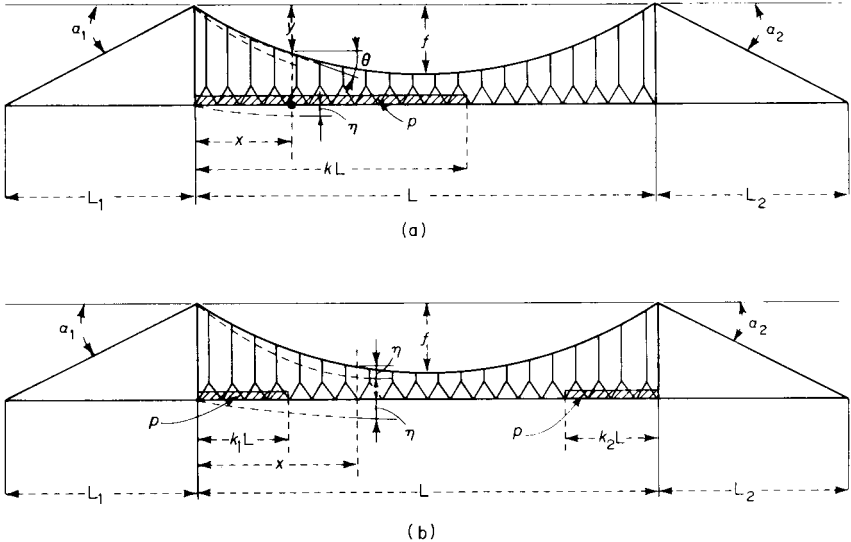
Suspension bridge with unloaded side spans and pin-ended main-span truss. (a) Single uniform load extending from a pylon into the main span. (b) Uniform load extending from both pylons into the main span.
